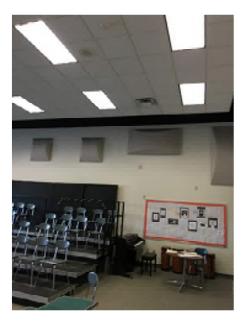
2x2 ACT Cloud system installed in Music Rooms.
